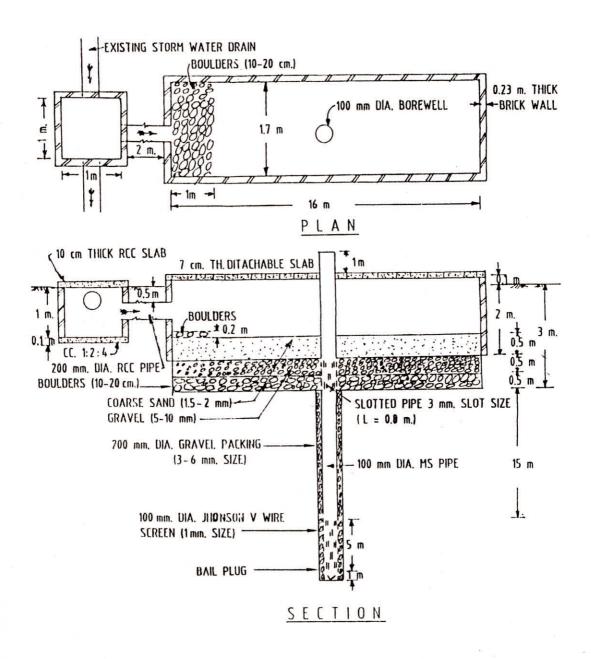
Design of Recharge Trench – 1 at CSMRS, New Delhi
